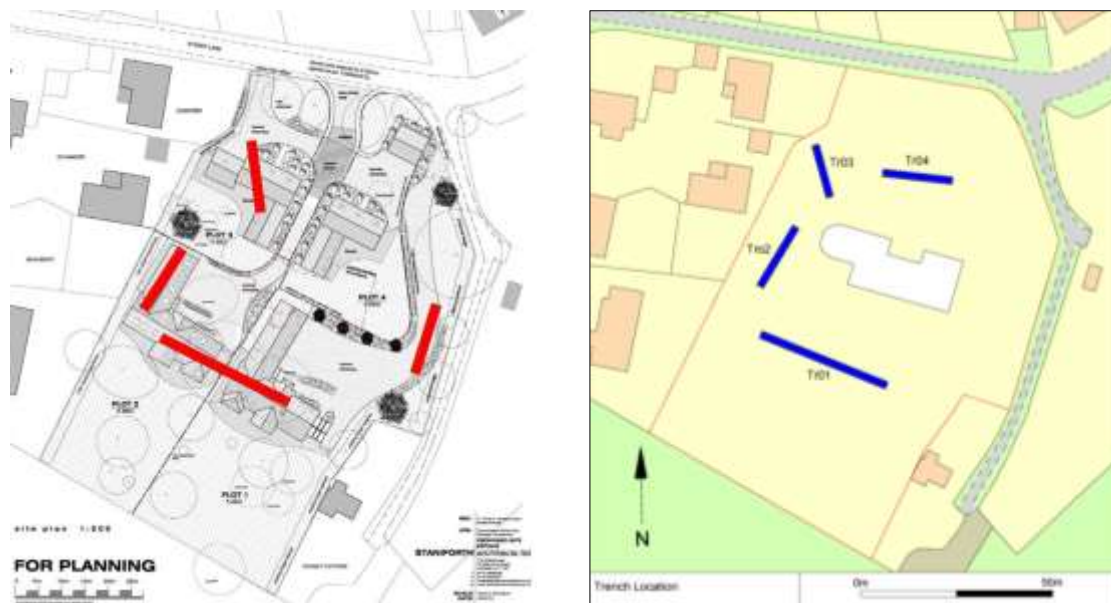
Trench Locations overlying the proposed development (proposed) and in relation to the existing building (actual). Plan provided by client.
